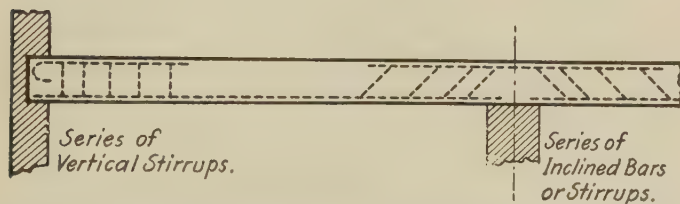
Typical Reinforced Concrete Beam without Special Anchorage; Web Reinforced by Means of Series of Vertical Stirrups or Series of Inclined Bars or Stirrups.
